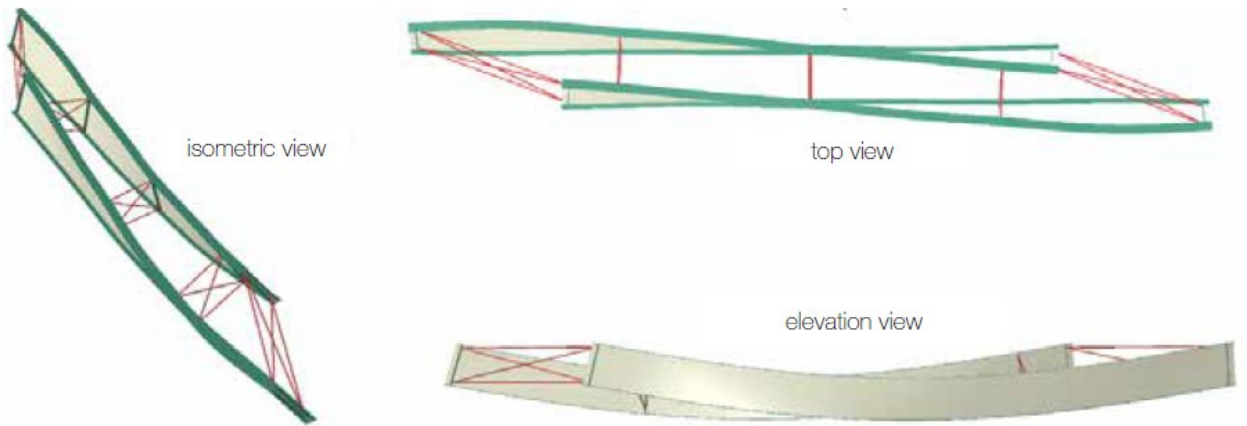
Girder deflections and twist for two simple-span i-girders on parallel skewed supports, subjected to steel dead load, after connecting the cross-frames, from NSBA (2016).
